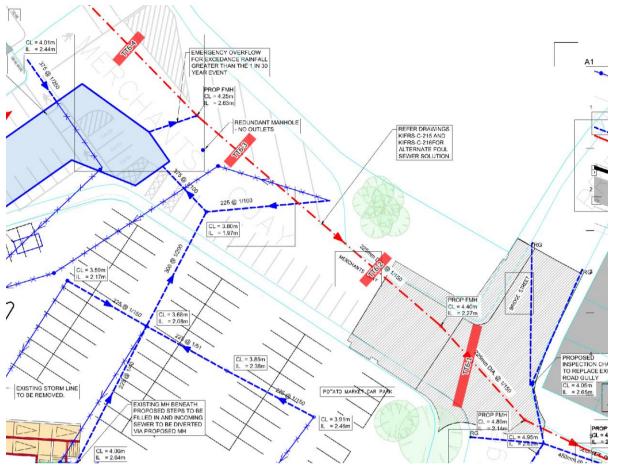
Proposed testing in Area 6 – TT6-1 & TT6-4.
